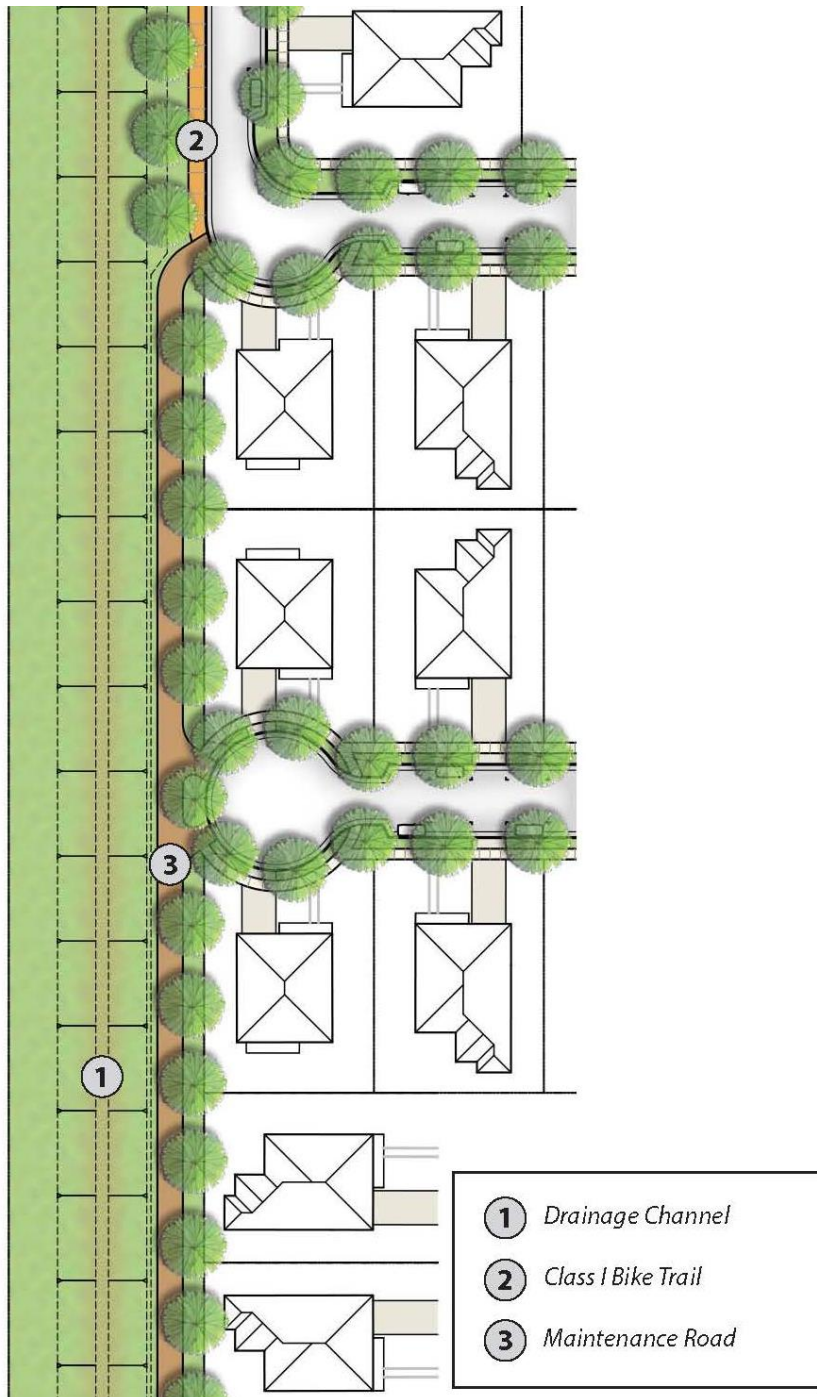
Edge Conditions Along Drainage Channel - Plan View
